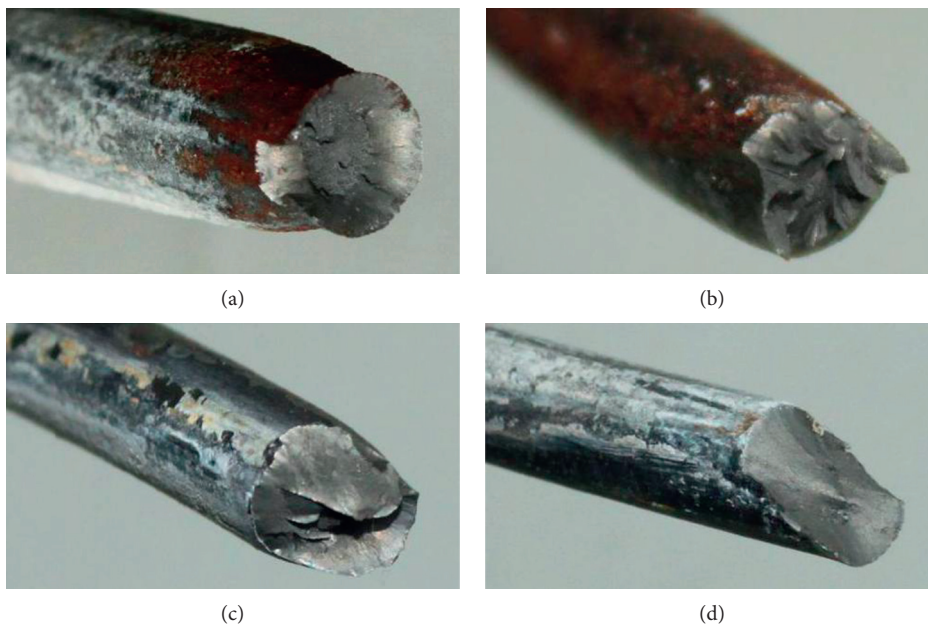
Fracture types of corroded steel strand wires: (a) cup-and-cone fracture; (b) milling-cutter fracture; (c) cleavage-milling-cutter fracture; (d) cleavage fracture.
